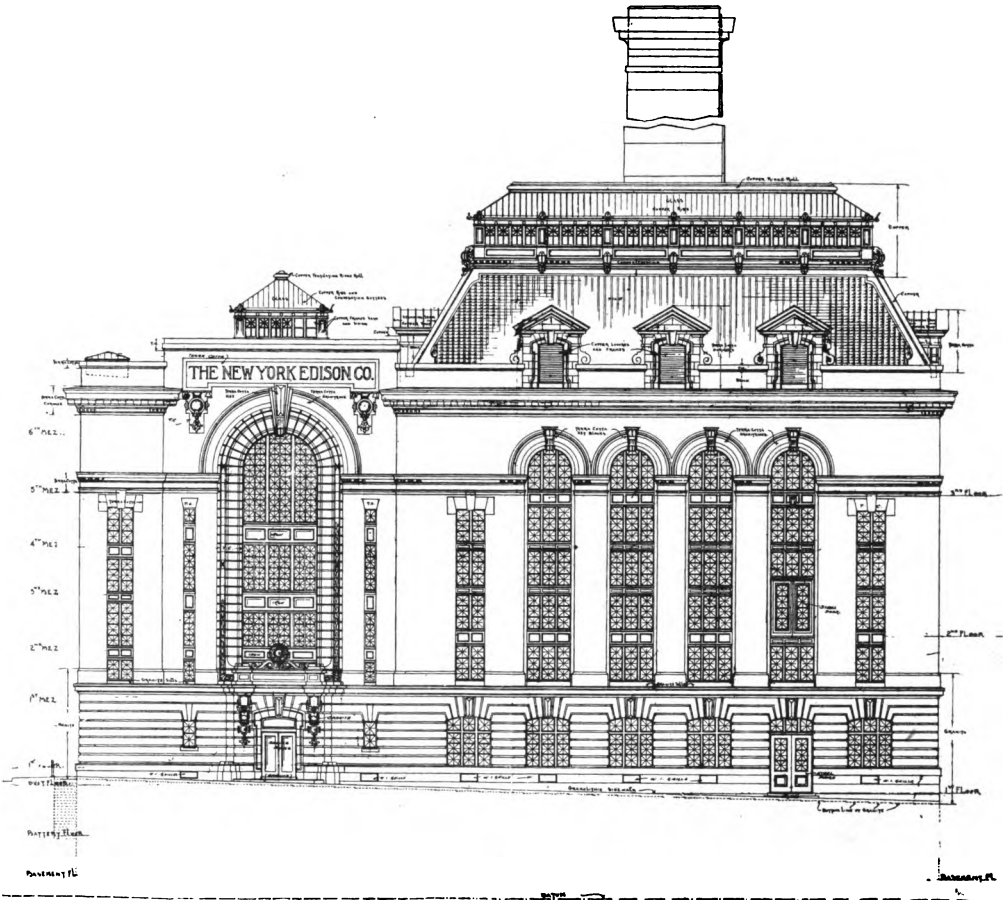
Front Elevation, First Ave., Waterside No. 2.
